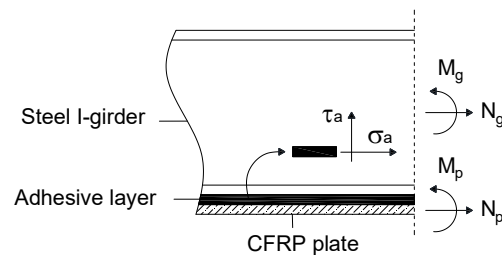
Equilibrium between girder, adhesive, and CFRP plate.
